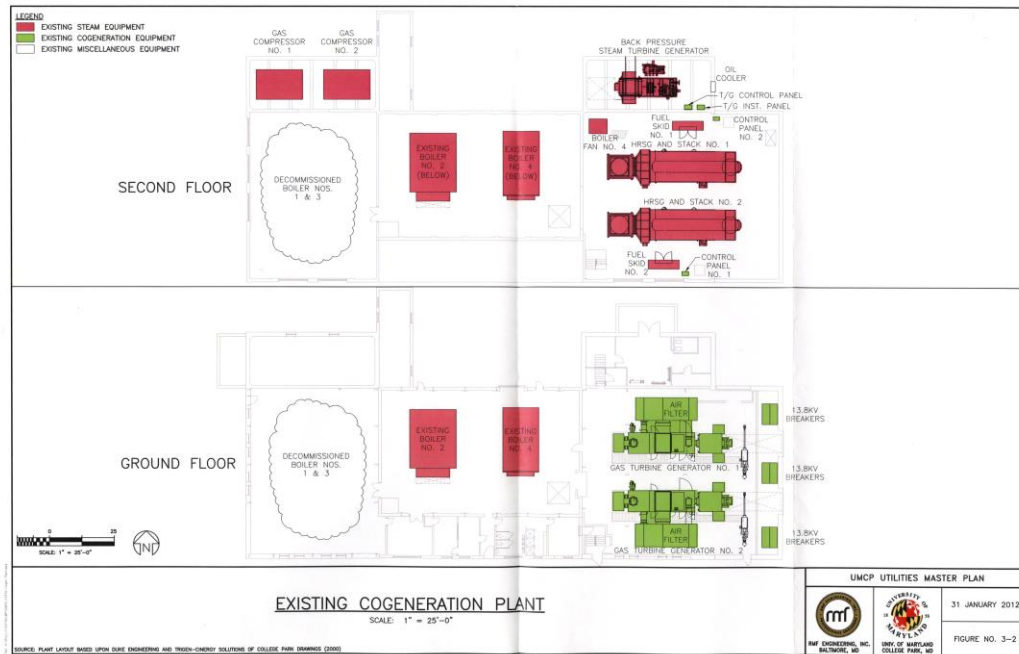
Layout of Cogeneration Plant. (Source: RMF Engineering, CDM Smith Group. “UMCP Facilities Master Plan.”. University of Maryland, College Park, (2012).)
